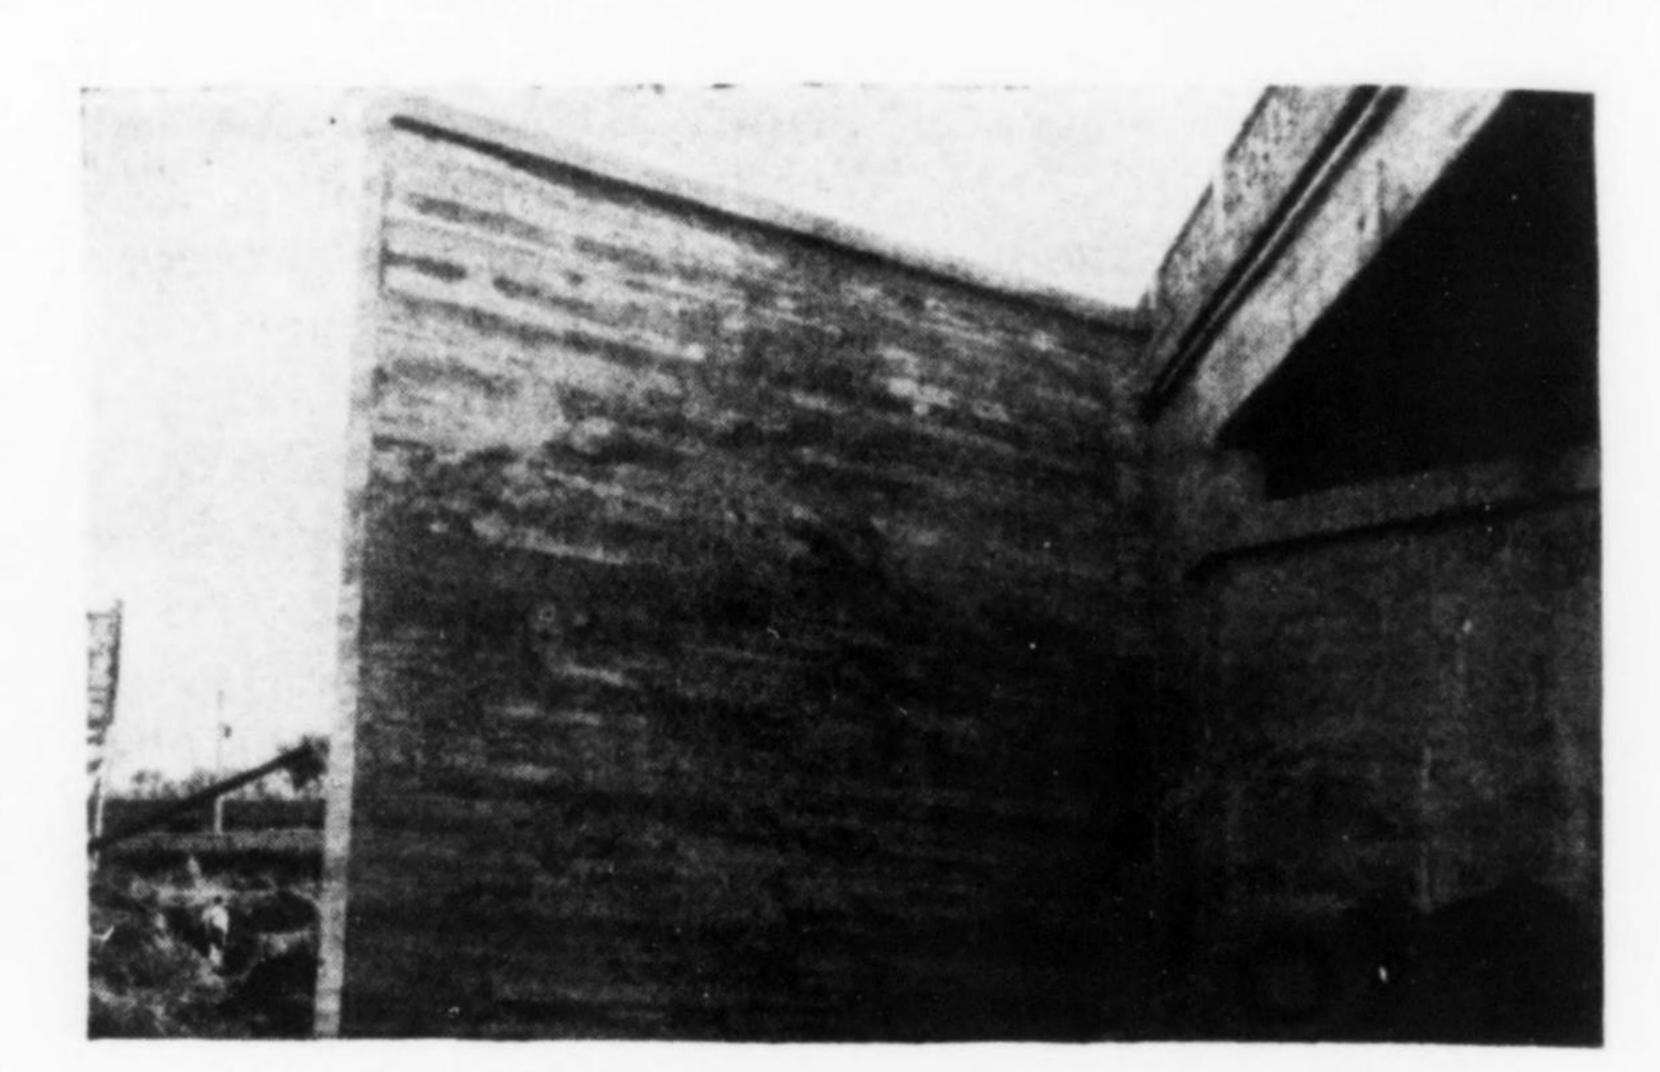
CUTOFF WALL IN LEVEE AT BRIDGE
